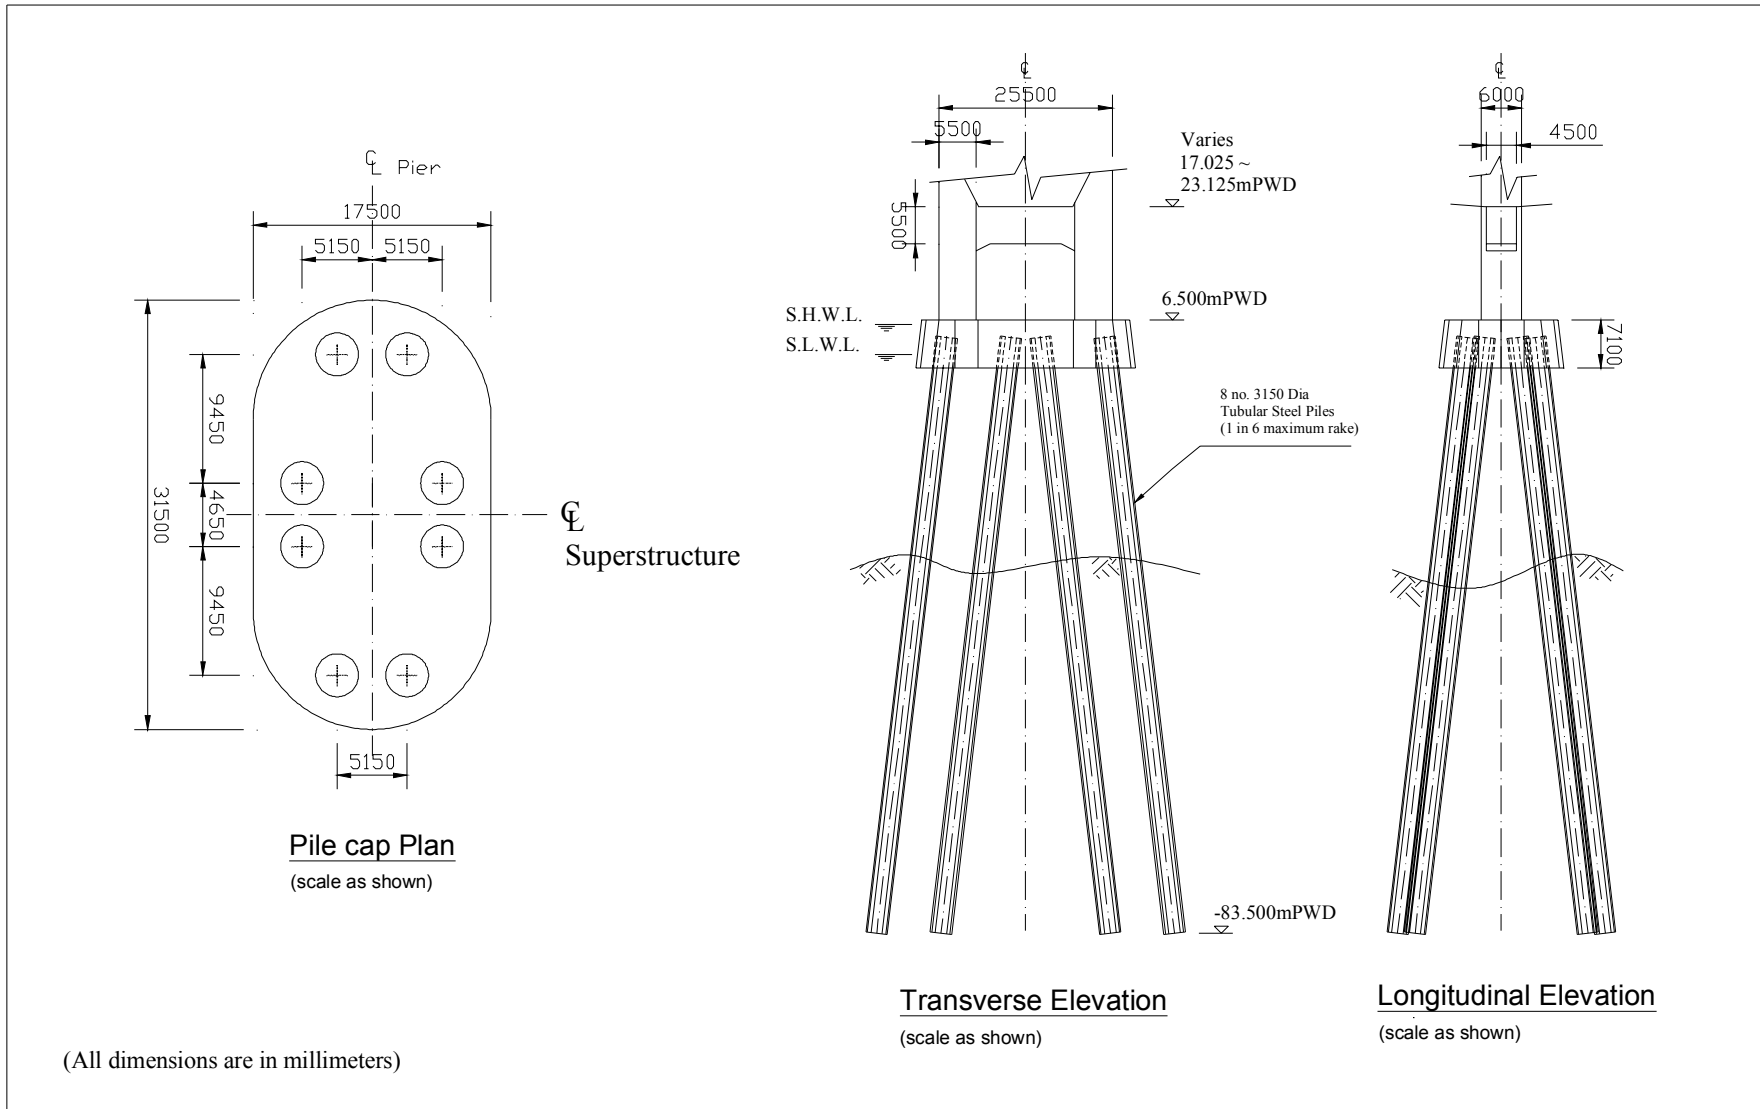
Mid-River Substructure General Arrangement (Alternative-H1)
